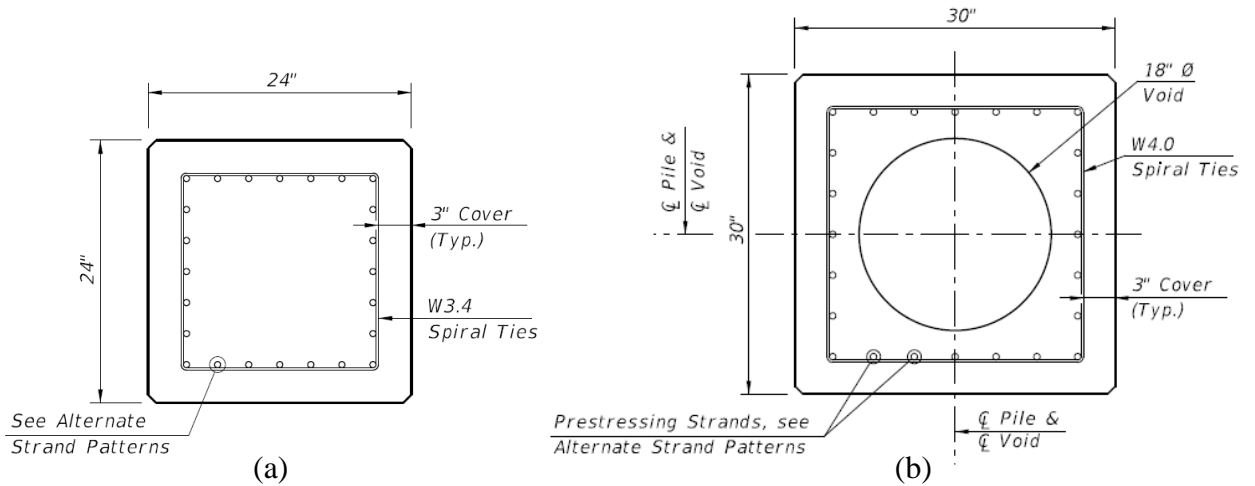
Details for (a) 24-inch and (b) 30-inch square prestressed concrete piles used in Bridge #2 [53]
